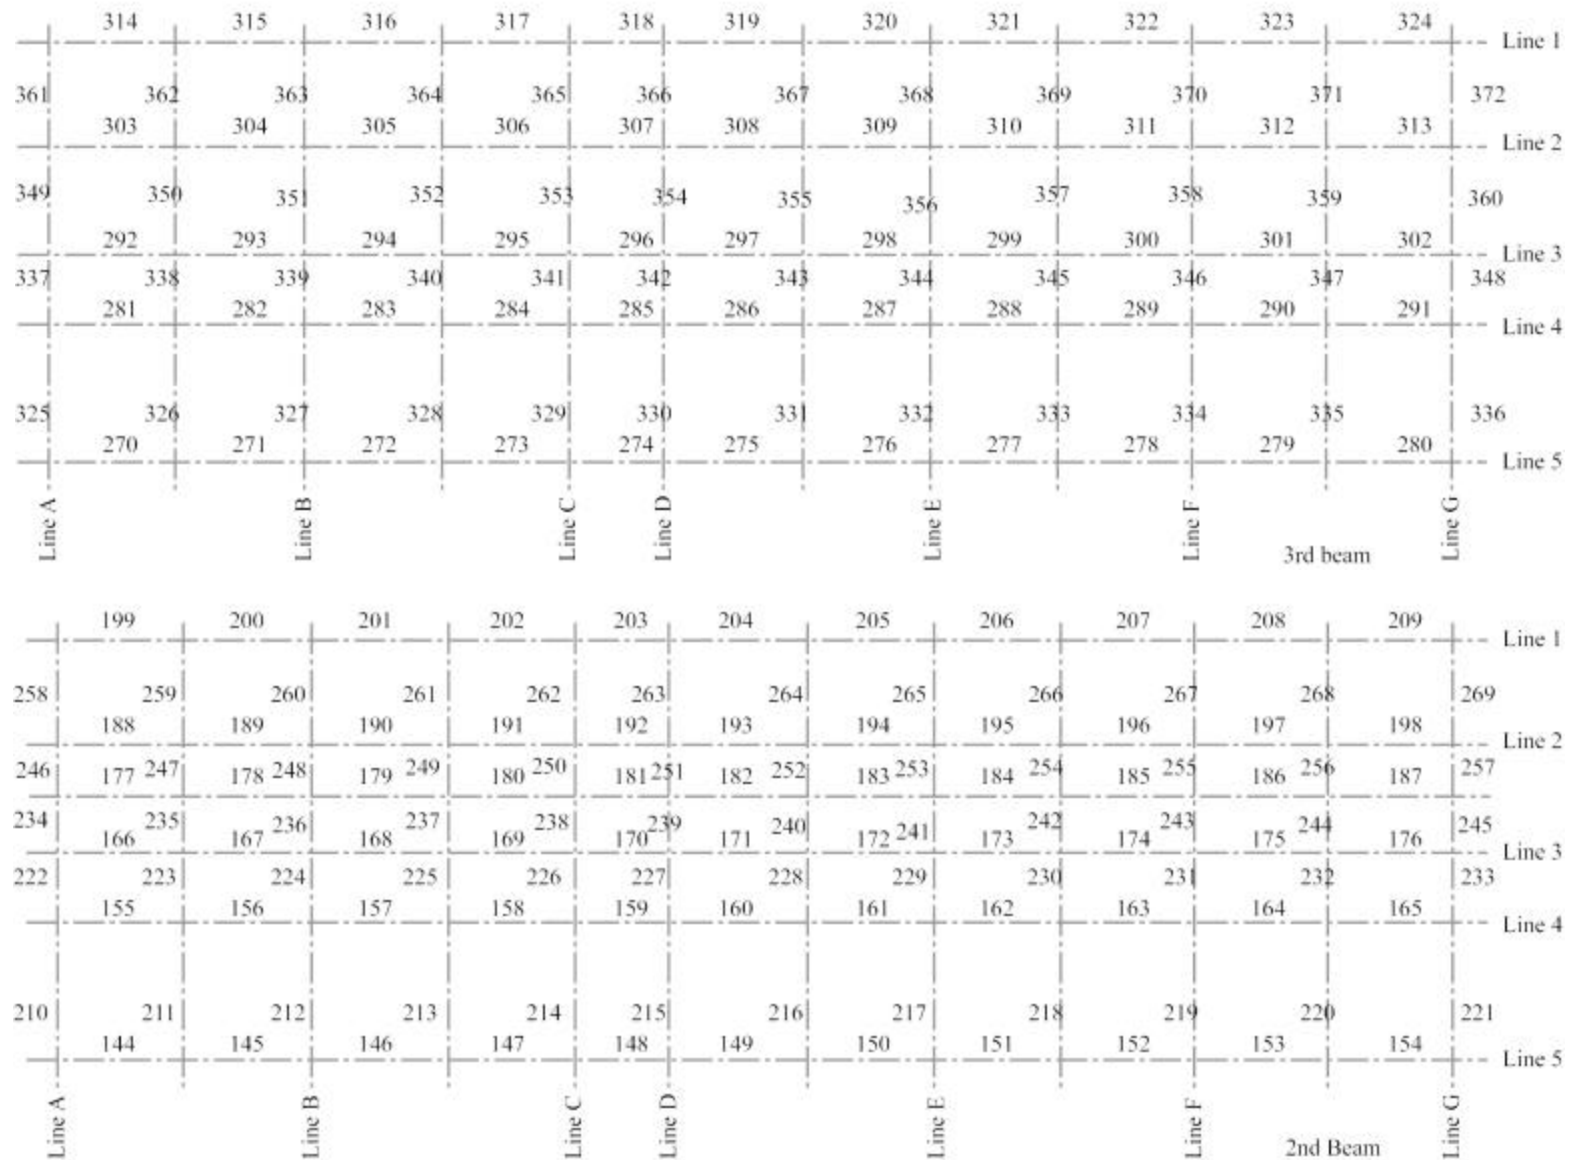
Locations, Orientation and Numbering of Frame Elements of the Apartment Index Building.
